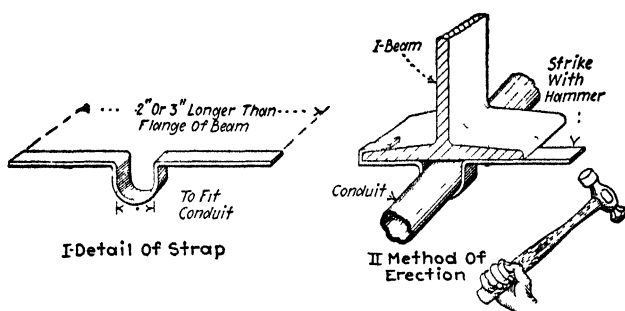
A simple hanger for holding a conduit to the flange of an I-beam.
